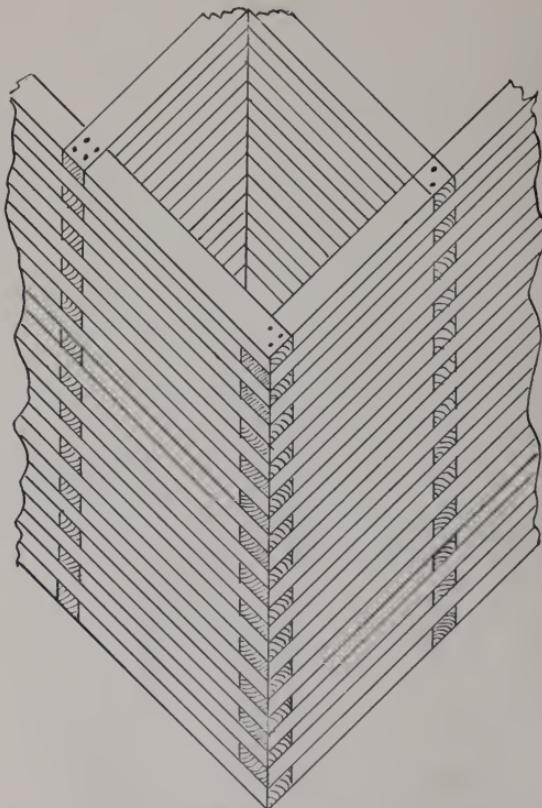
METHOD OF BUILDING BINS BY OVERLAPPING AND CROSSING JOINTS.
